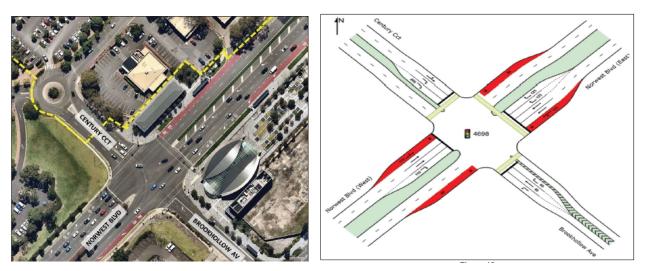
Existing intersection layout (L) and proposed intersection layout (R) (source: Traffic & Parking Study)
